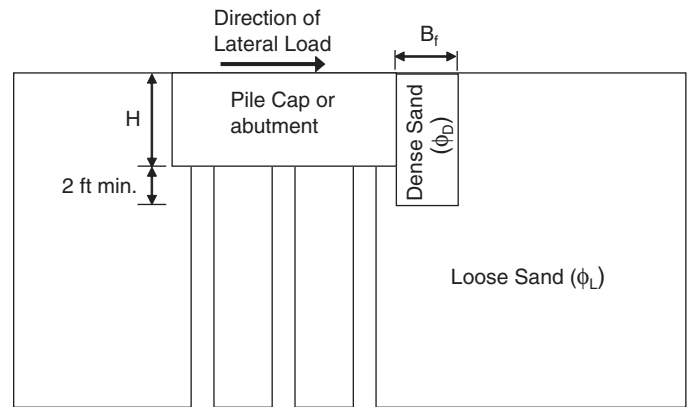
Layout of geometry for limited width dense backfill zone adjacent to pile cap or abutment.
